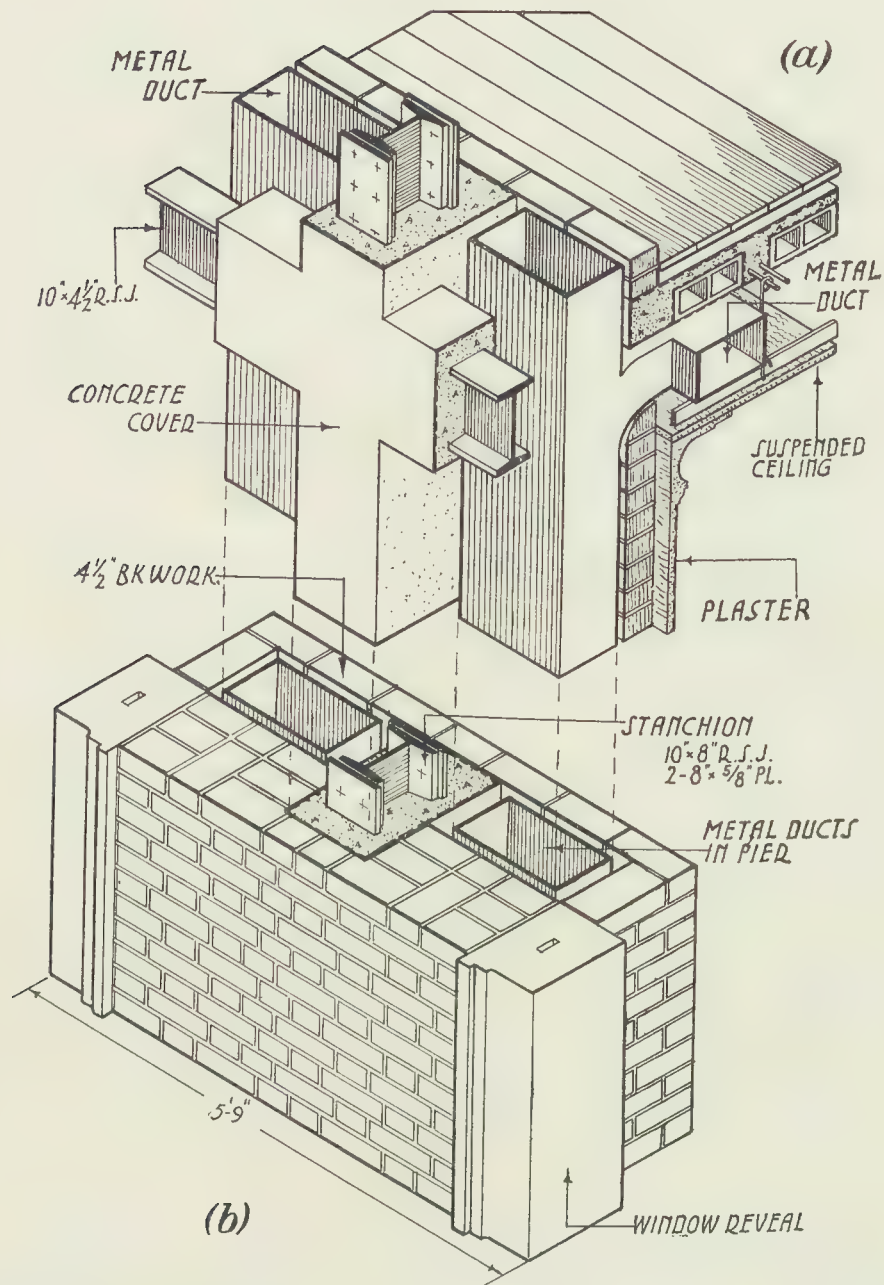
PROVISION FOR HOUSING VENTILATION DUCTS IN WALLS AND UNDER FLOORS
